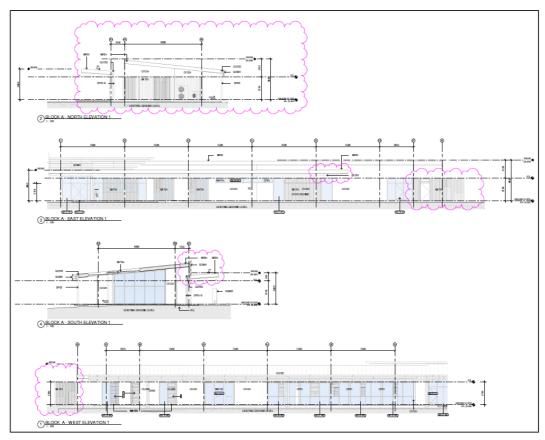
| Block A elevations (Source: Applicant's RtS 2021)
